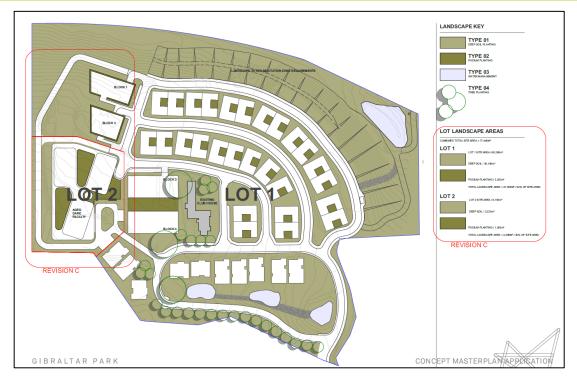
Stage 2 Concept Masterplan showing proposed landscape areas
